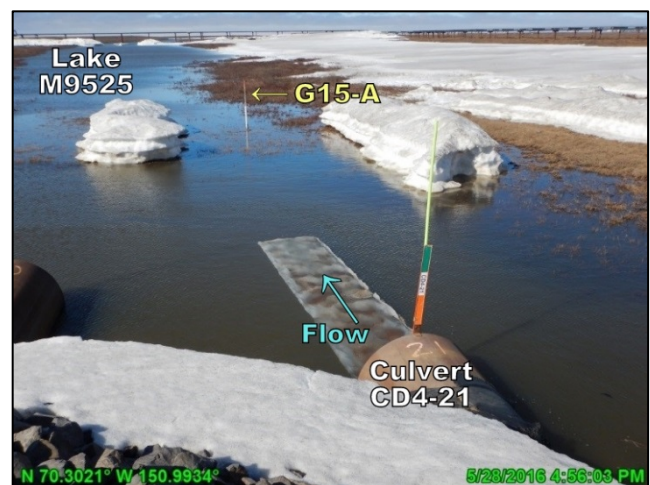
CD4 road at culvert CD4-21; looking north, May 28, 2016
